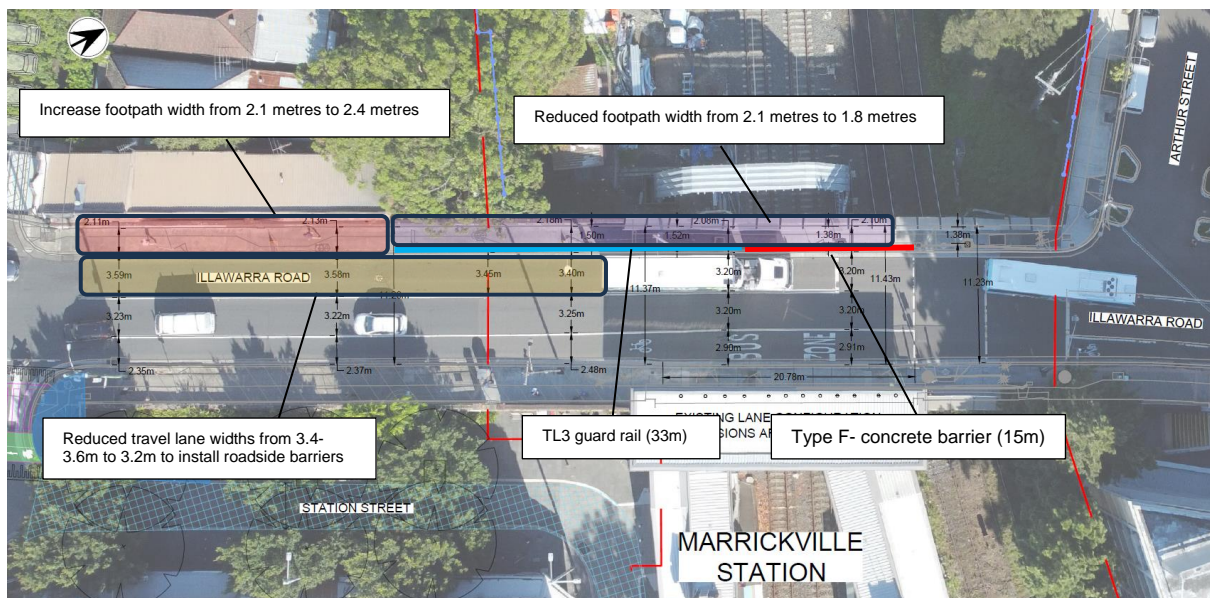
Plan of the existing lane configuration of Illawarra Road at Marrickville Station
